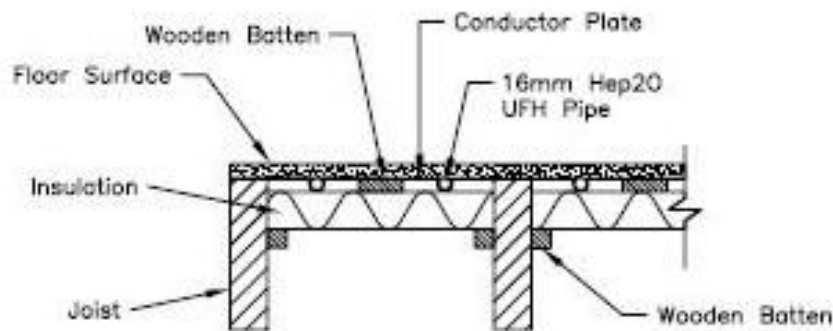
Suspended Floor Construction (Joy Plumbing Limited, 2017)
